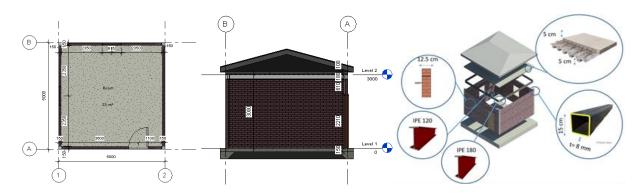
Case study- II: architectural plan (left), section (middle), structural system details of steel-framed structure (right).
